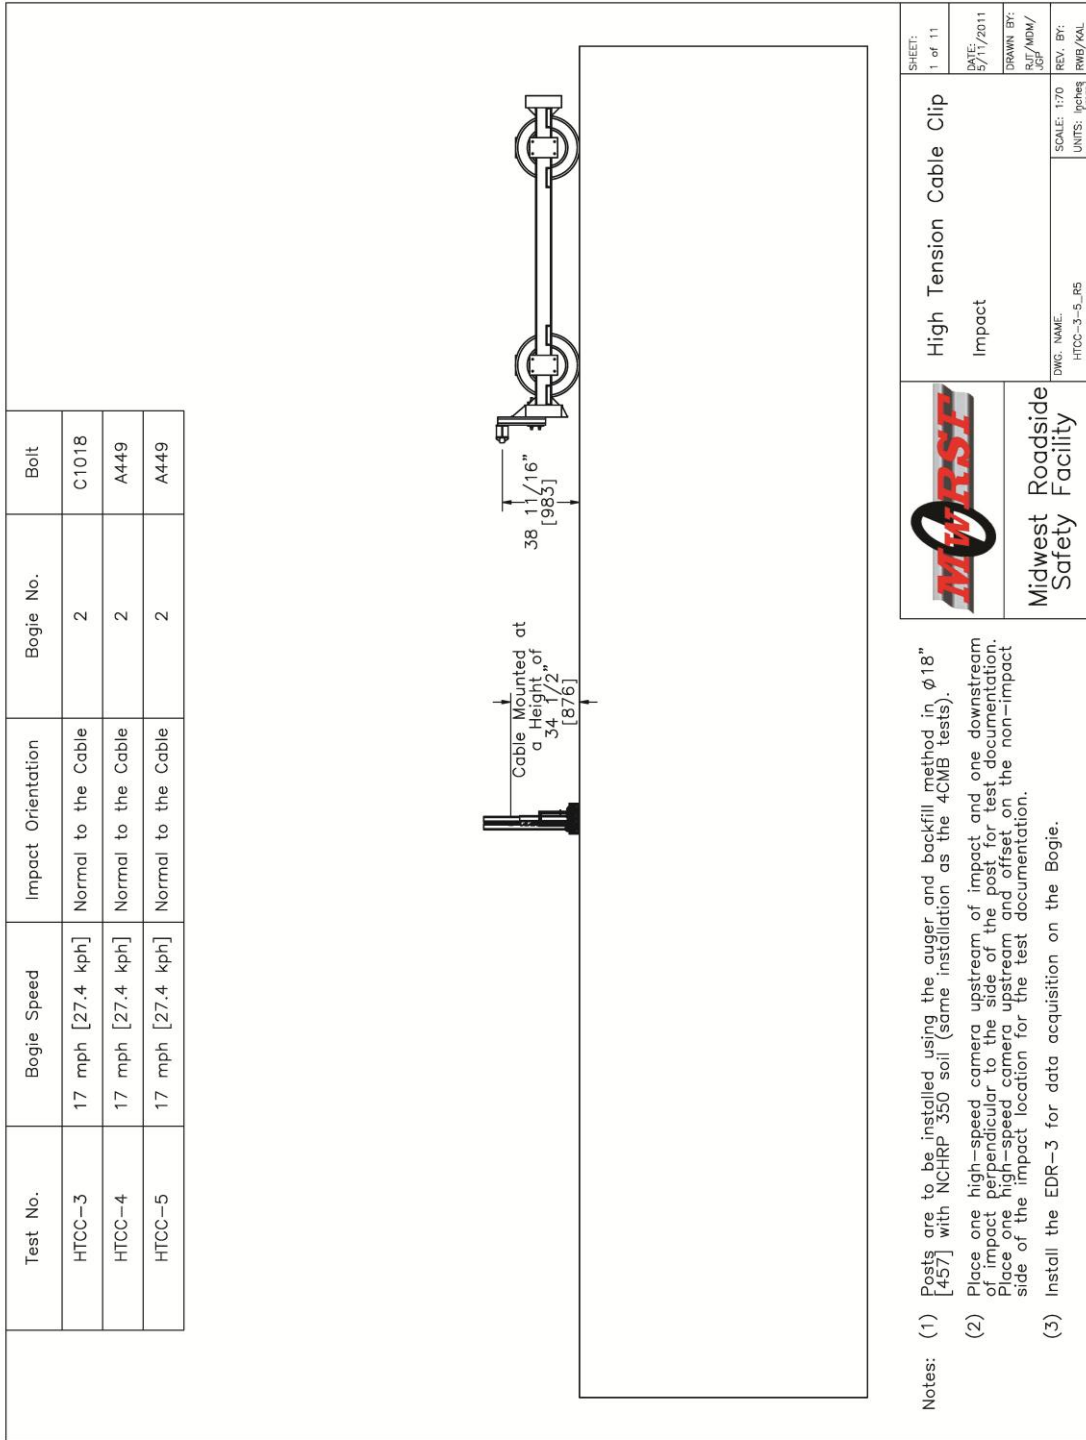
Testing Details, Test Nos. HTCC-4 and HTCC-5
